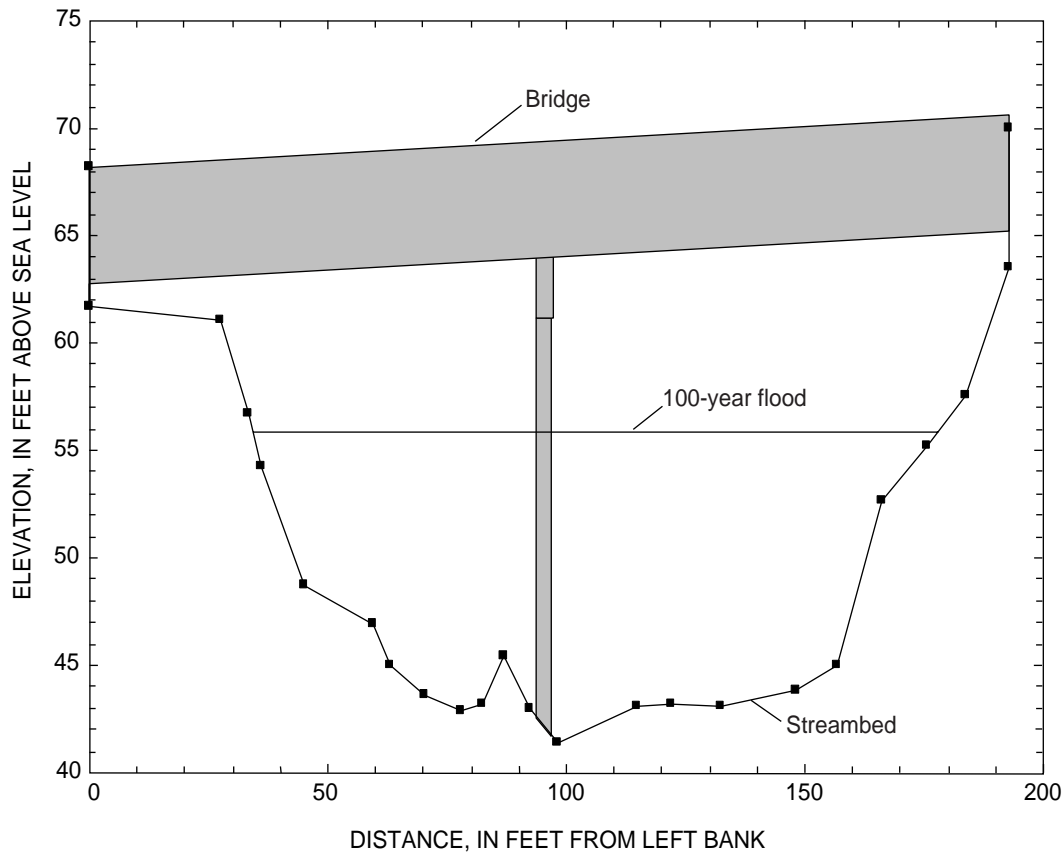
Cross section 93, showing upstream side of the Mendenhall River Road Bridge, Alaska.
